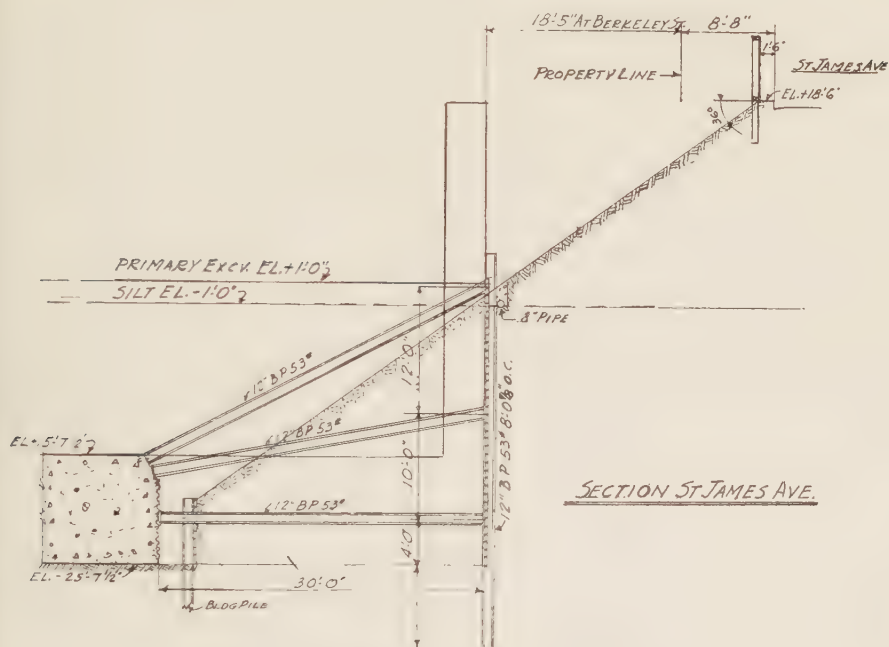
ELEVATION OF TYPICAL BRACING SYSTEM.
